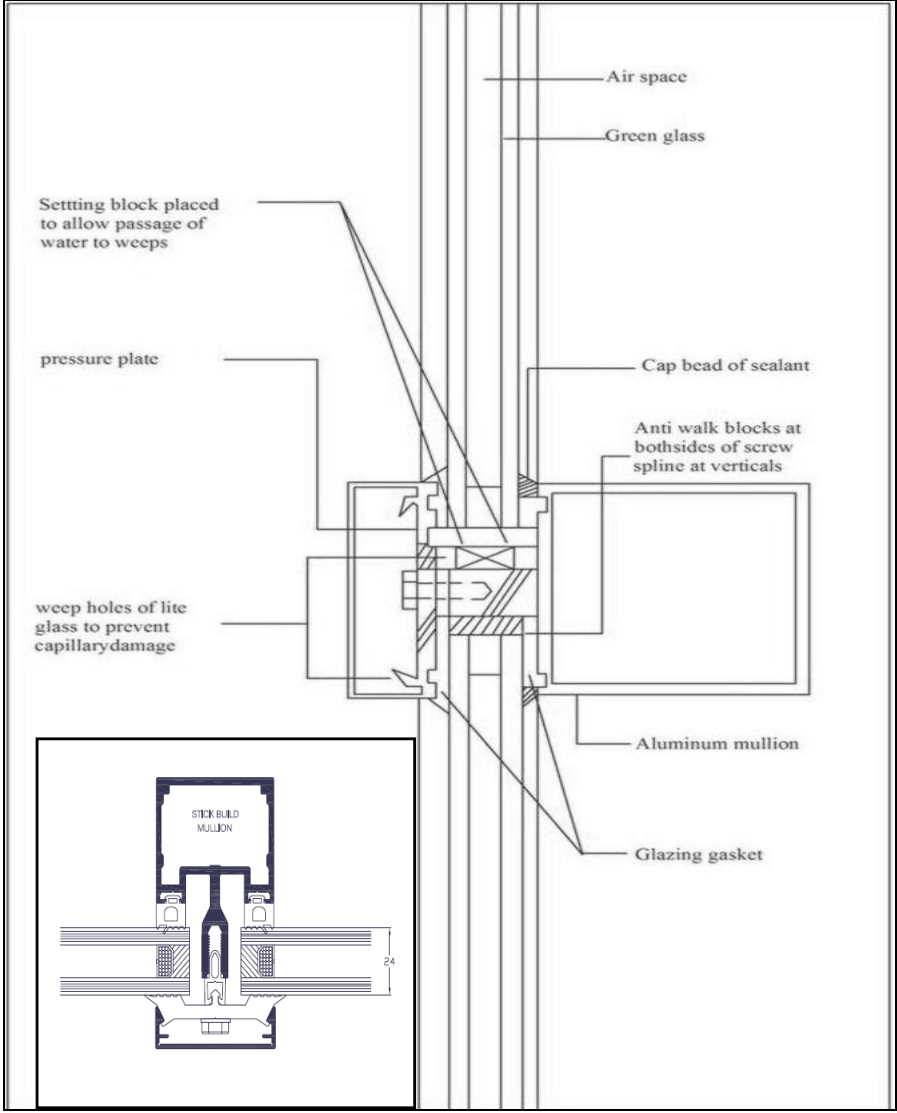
Mullion Arrangement and a Horizontal Section of a Mullion and Glass Connection for Stick Type in Shun Hing Plaza (Drawn by author)
